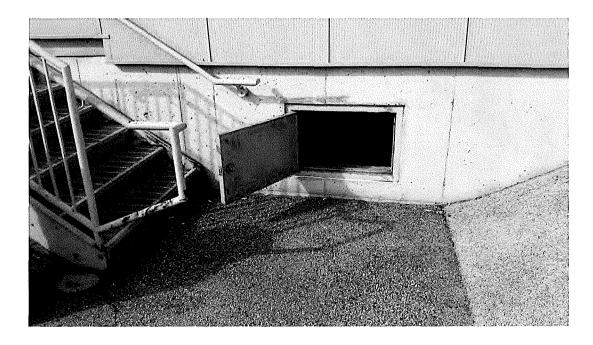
1245 Canal; crawl space entrance, column EE/FF16.
